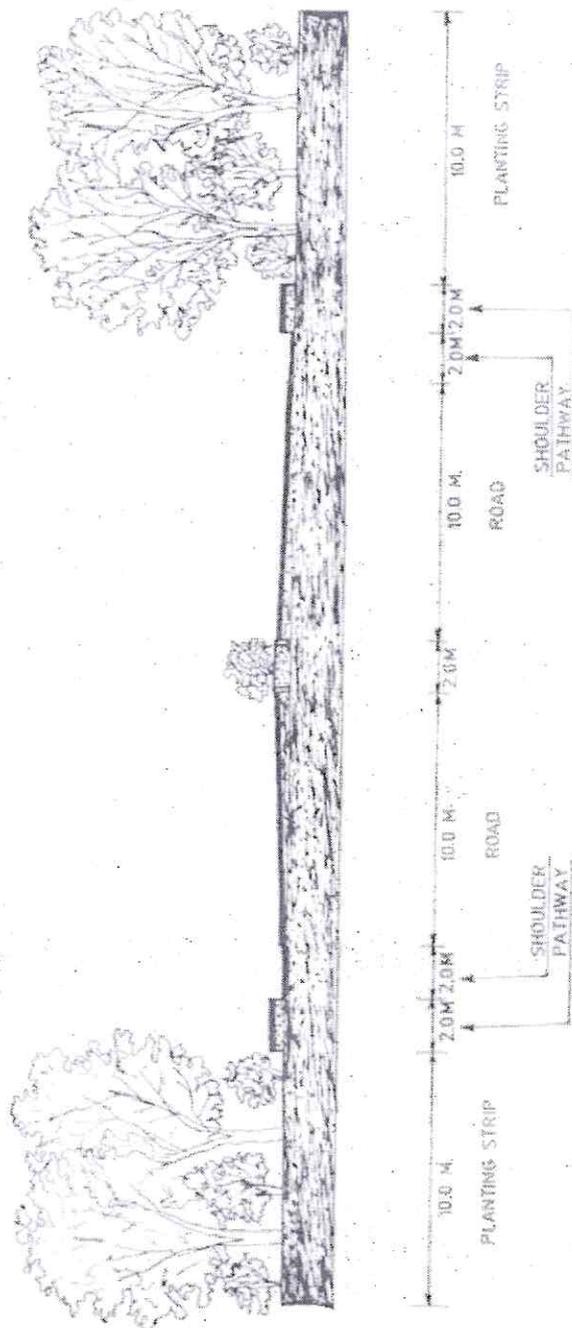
TYPICAL ROAD-SIDE PLANTATION
